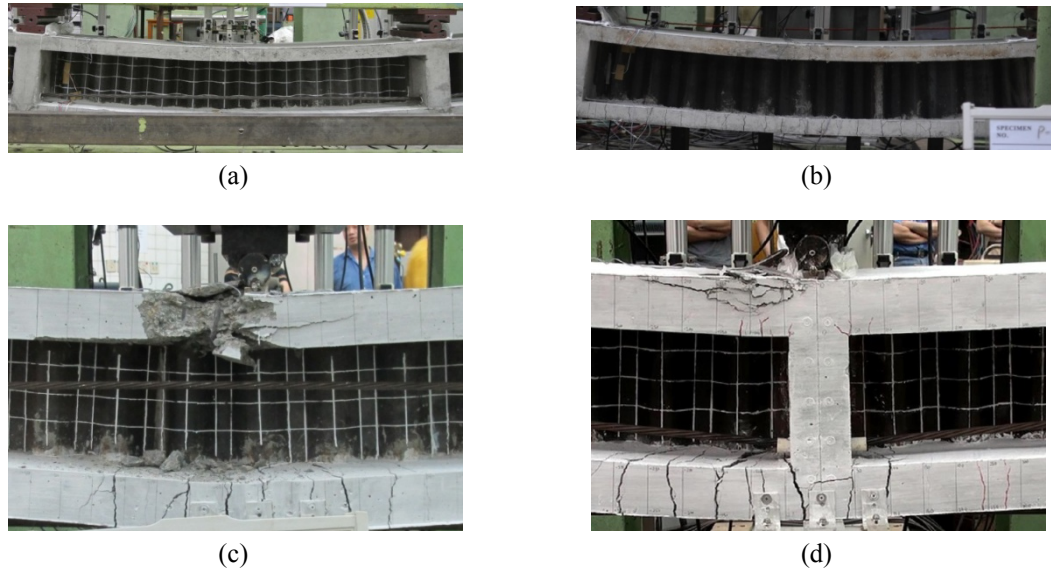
Deformation around mid-span of specimens tested: (a) Specimen A-1; (b) Specimen P-1; (c) Specimen B-1; and (d) Specimen B-2
